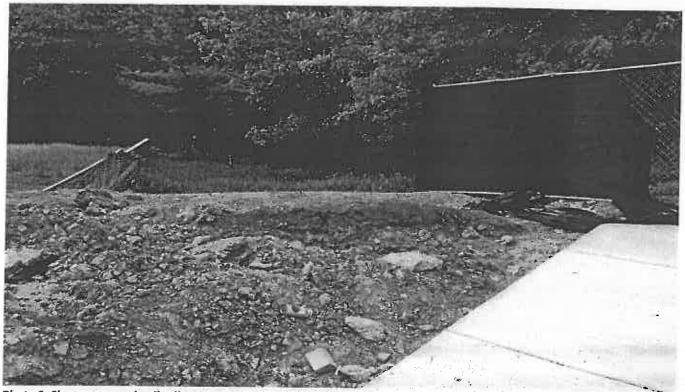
Shows exposed soil adjacent storm water management pond at the new tennis court
